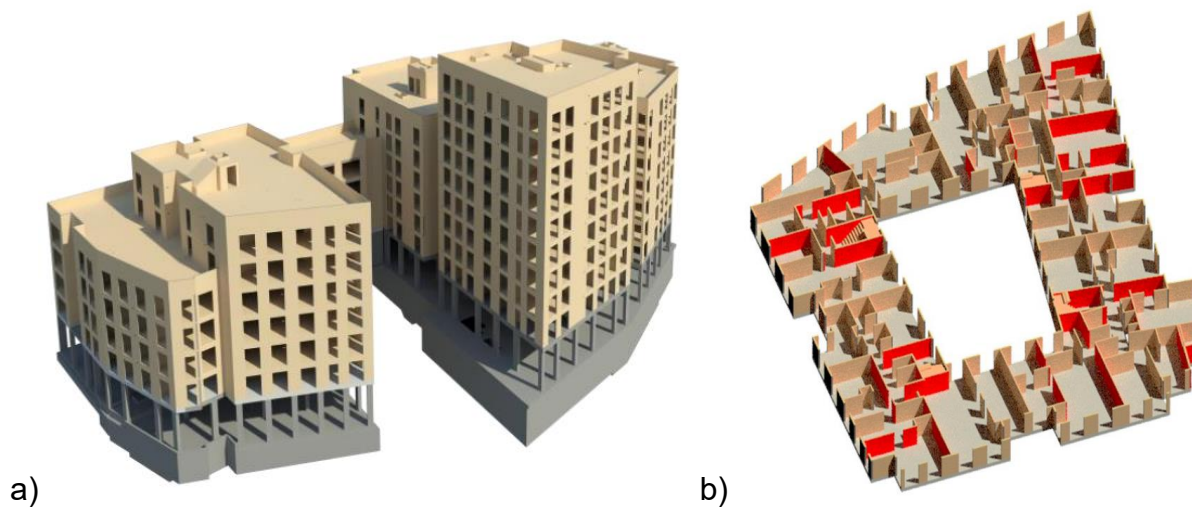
4 Dalston lane CLT structural system (a) in its entirety and (b) showcase of floorplan arrangement with stability walls highlighted in red (Harley et al., 2016)
